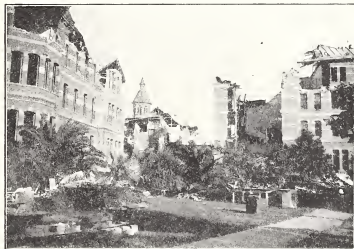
View at Agnews Showing the Complete Collapse of the Main Tower of the Asylum.
